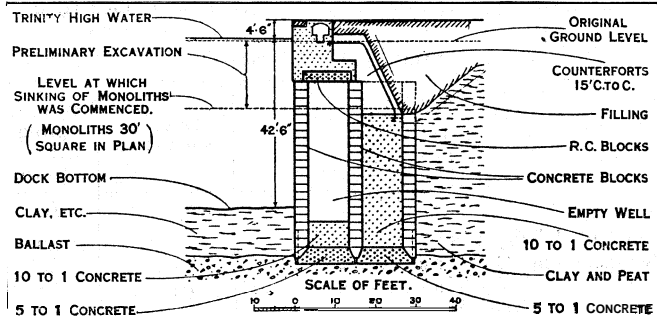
TILBURY DOCK WALL, 1917. SHOWING CONCRETE WELL MONOLITH
